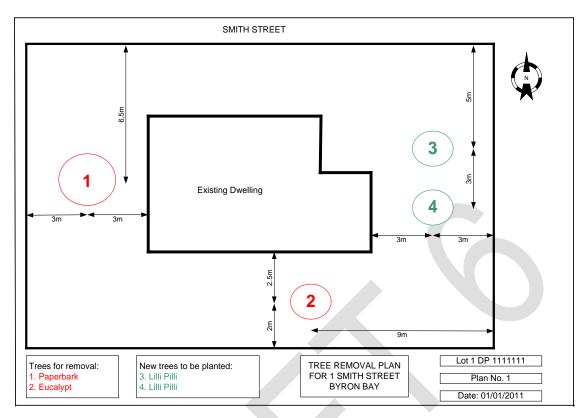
Example of a Site Plan accompanying a Tree Permit for Vegetation Removal/Pruning
